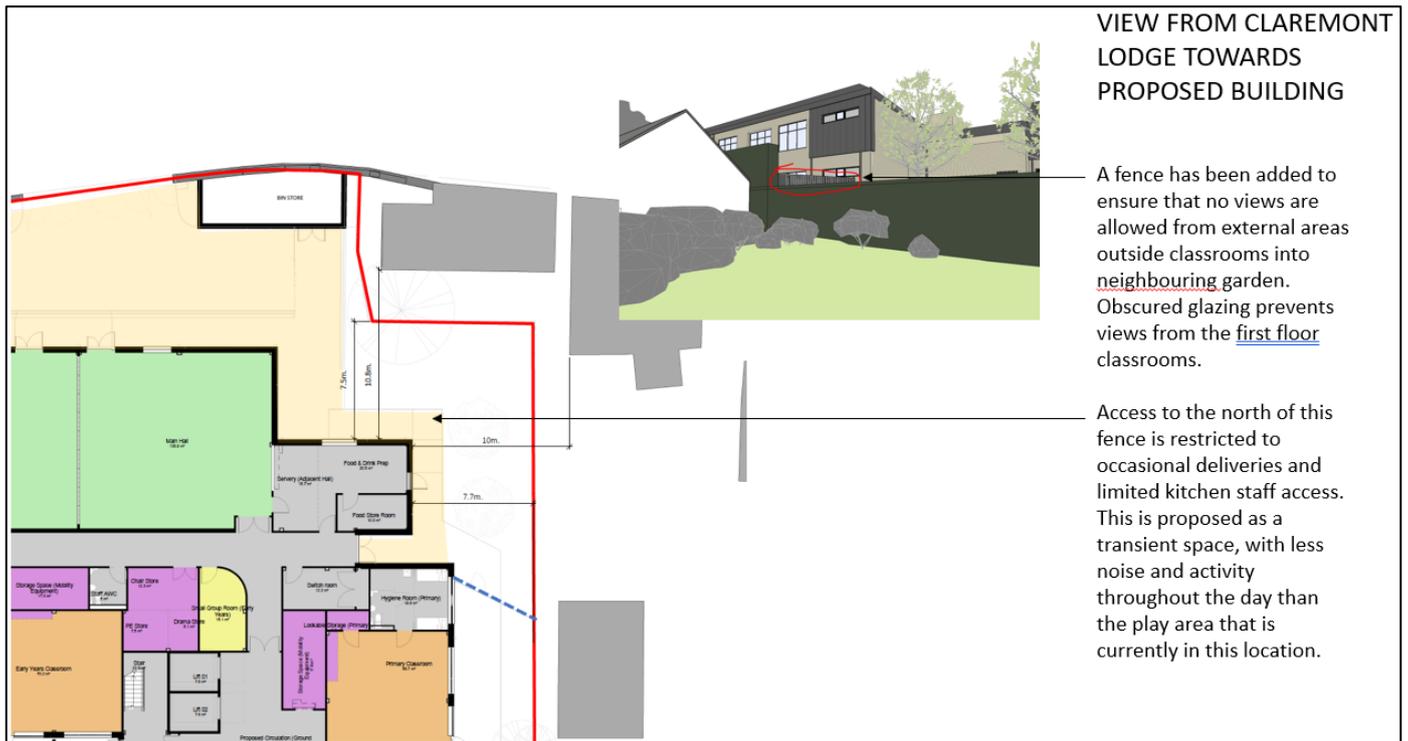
Plan extract and image indicating the fence to prevent views from classroom external area to Claremont Lodge garden.
